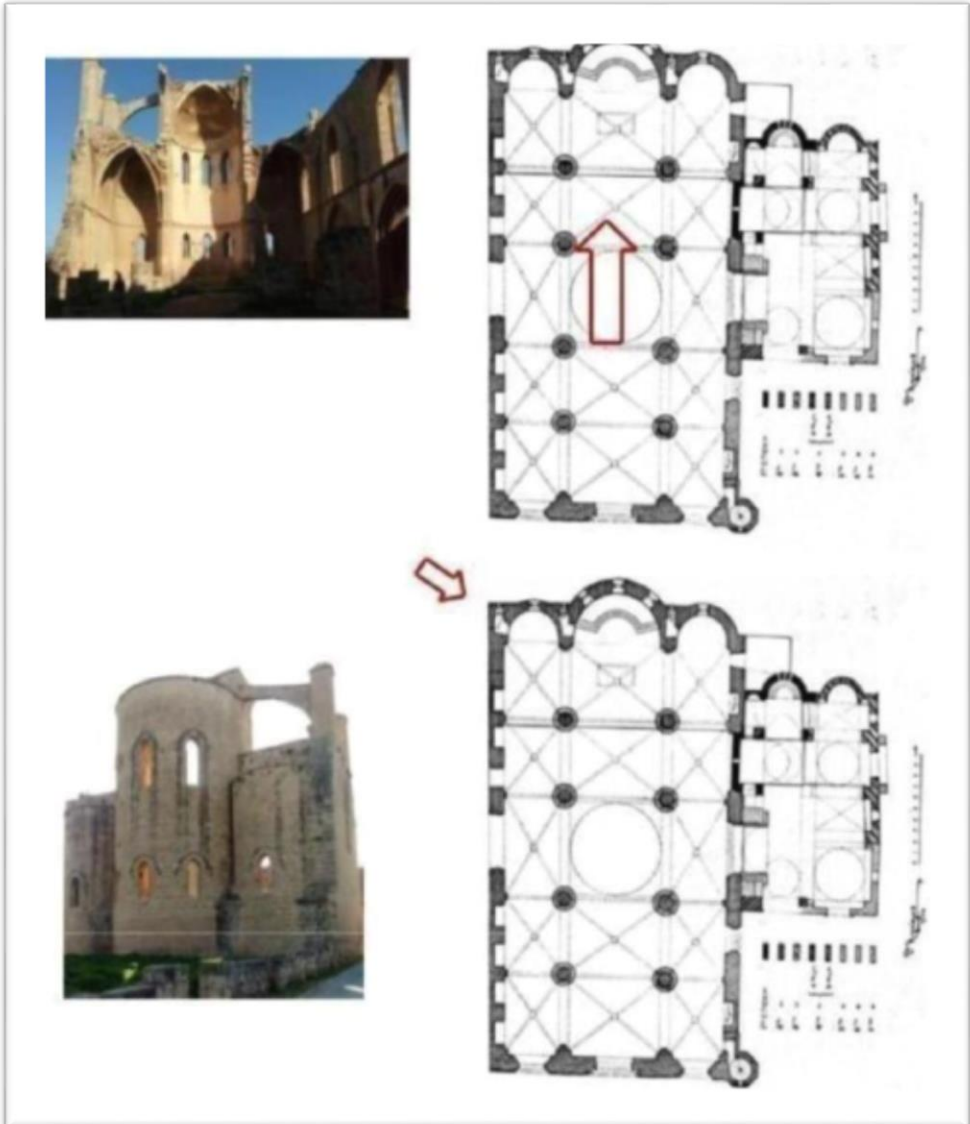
Elevation and Shape of the building (I' Anson, 1883, Pirlanta,2014)
